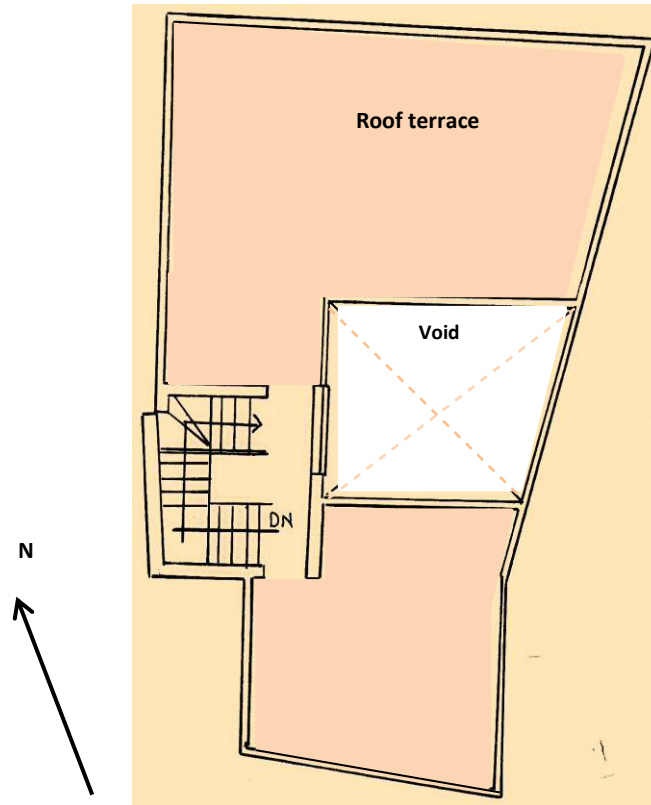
Roof terrace level plan of the modern house No. 3. Scale: 1:100
